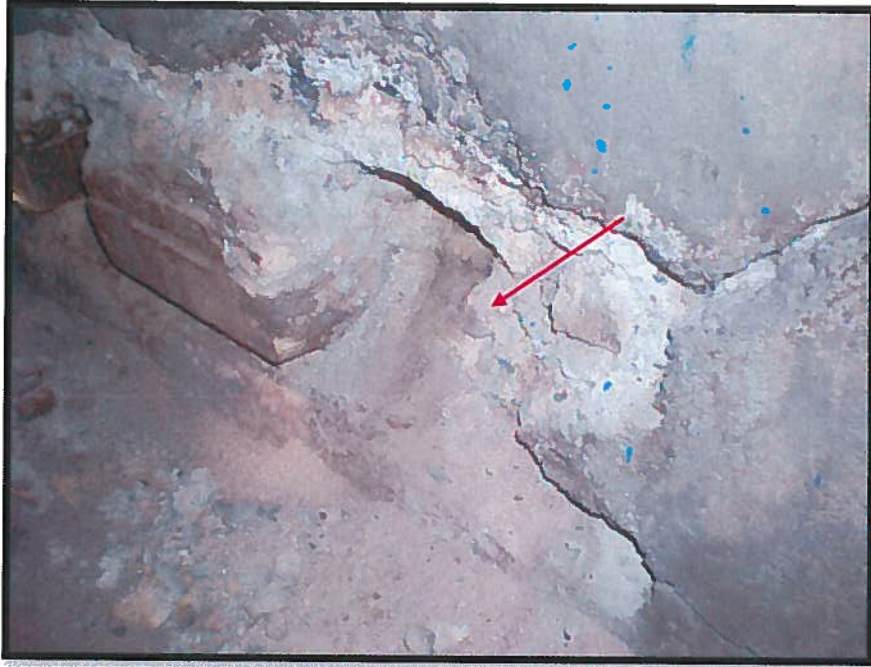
Dust on Concrete Pad/Floor South End of Building (Sample 13-D).
